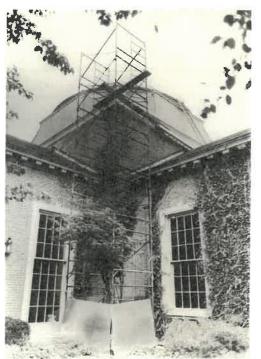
Dome roof replacement in progress, 1984. Note that the limestone has been cleaned.
